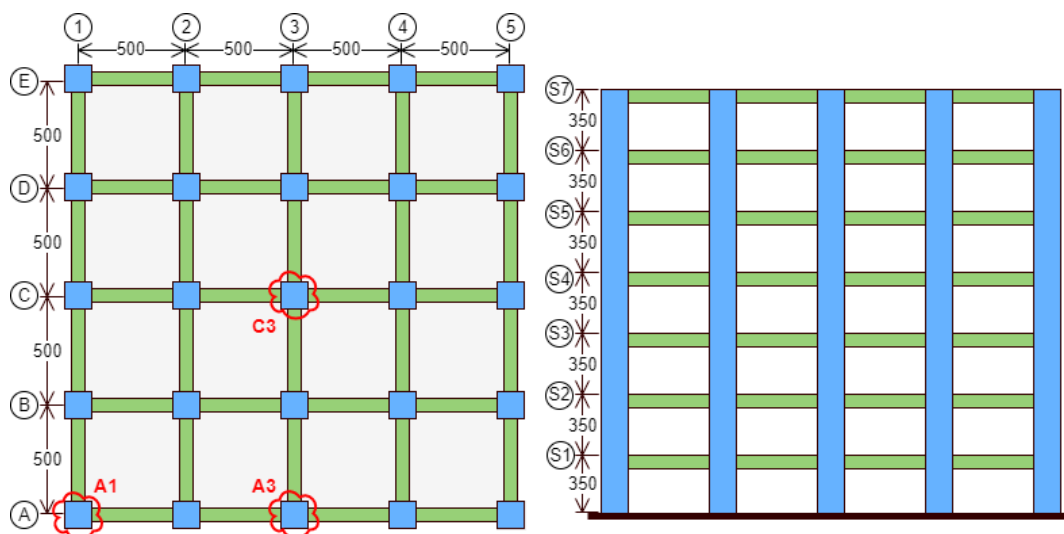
Plan (left) and elevation (right) views of the buildings (dimensions in cm)
